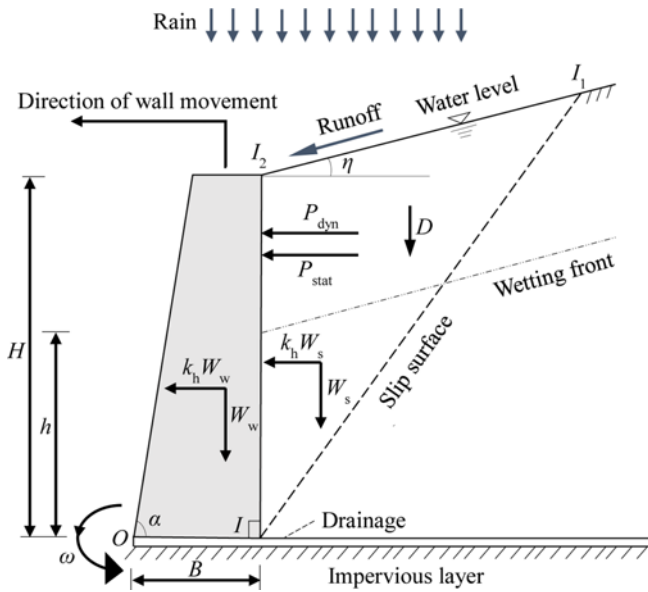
Pure Rotates Failure Mechanism of a Gravity Retaining Wall
